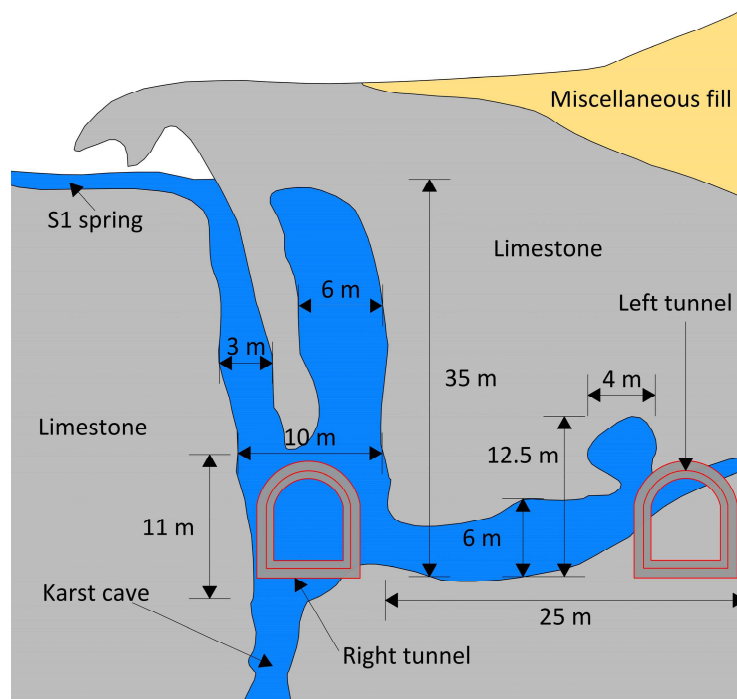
Diagram of the passage through the cavernous zone during the construction of the Yujingshan tunnel [24]
